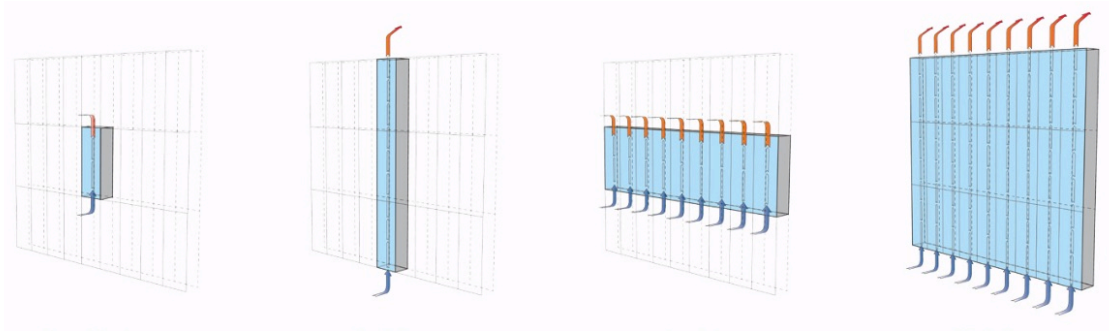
Overview of DSF concepts (a-d, left to right), box-window façade, shaft-box façade, corridor-façade, multi-storey façade [5].
